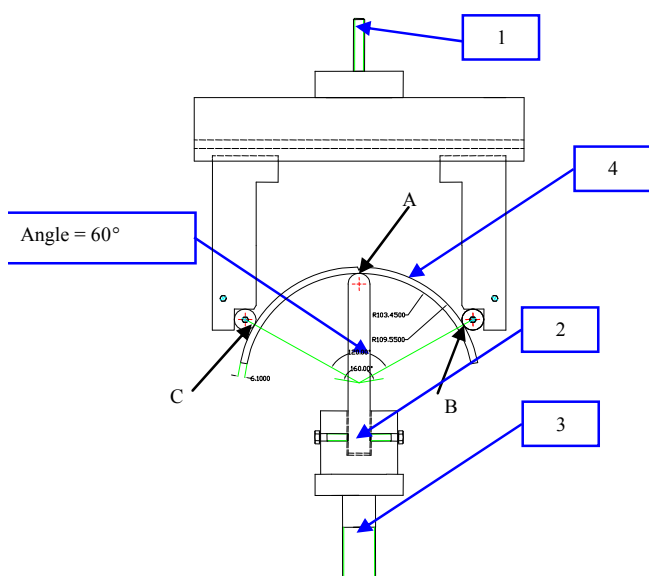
Roman Tile specimen fixture and assembly: 1–connection with load cell; 2–transmitting component with rounded tip; 3–connection of test assembly with the testing machine bottom; 4–“Roman tile” specimen.
